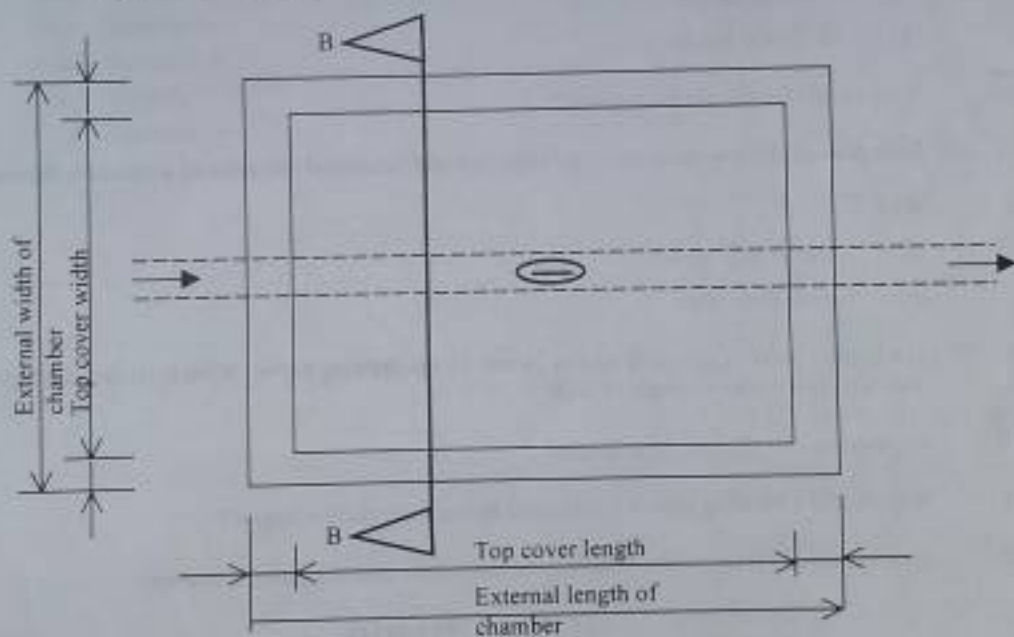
PLAN OF INSPECTION CHAMBER (NOT TO SCALE)
